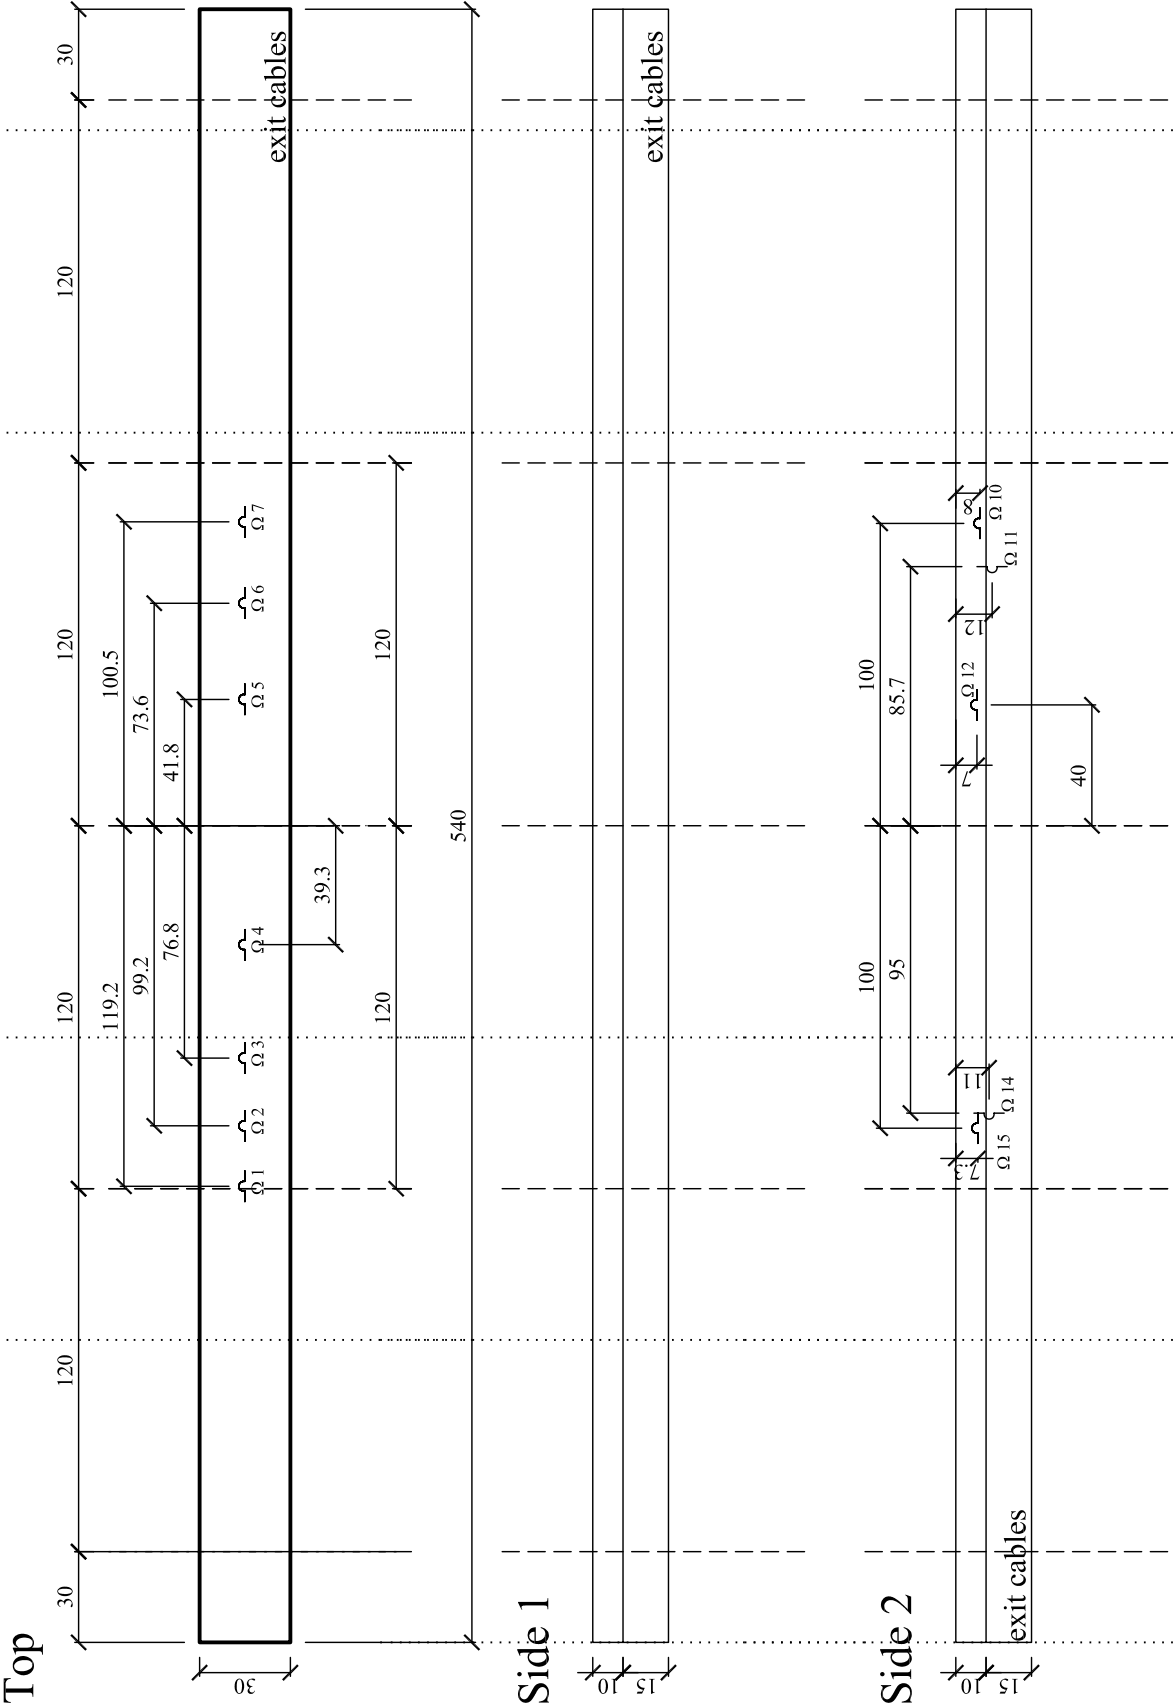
Position of the Ω -gages during the fracture test: I10
